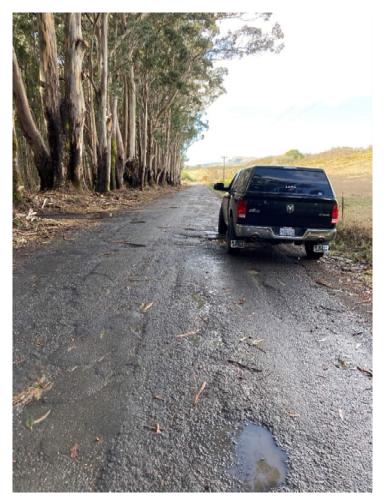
Representative of RS2 conditions (looking west). Details asphalt surface, 20'+ average road width, shoulders, turnouts, crowned geometry with fair drainage, average slopes <5% - max <12%.
